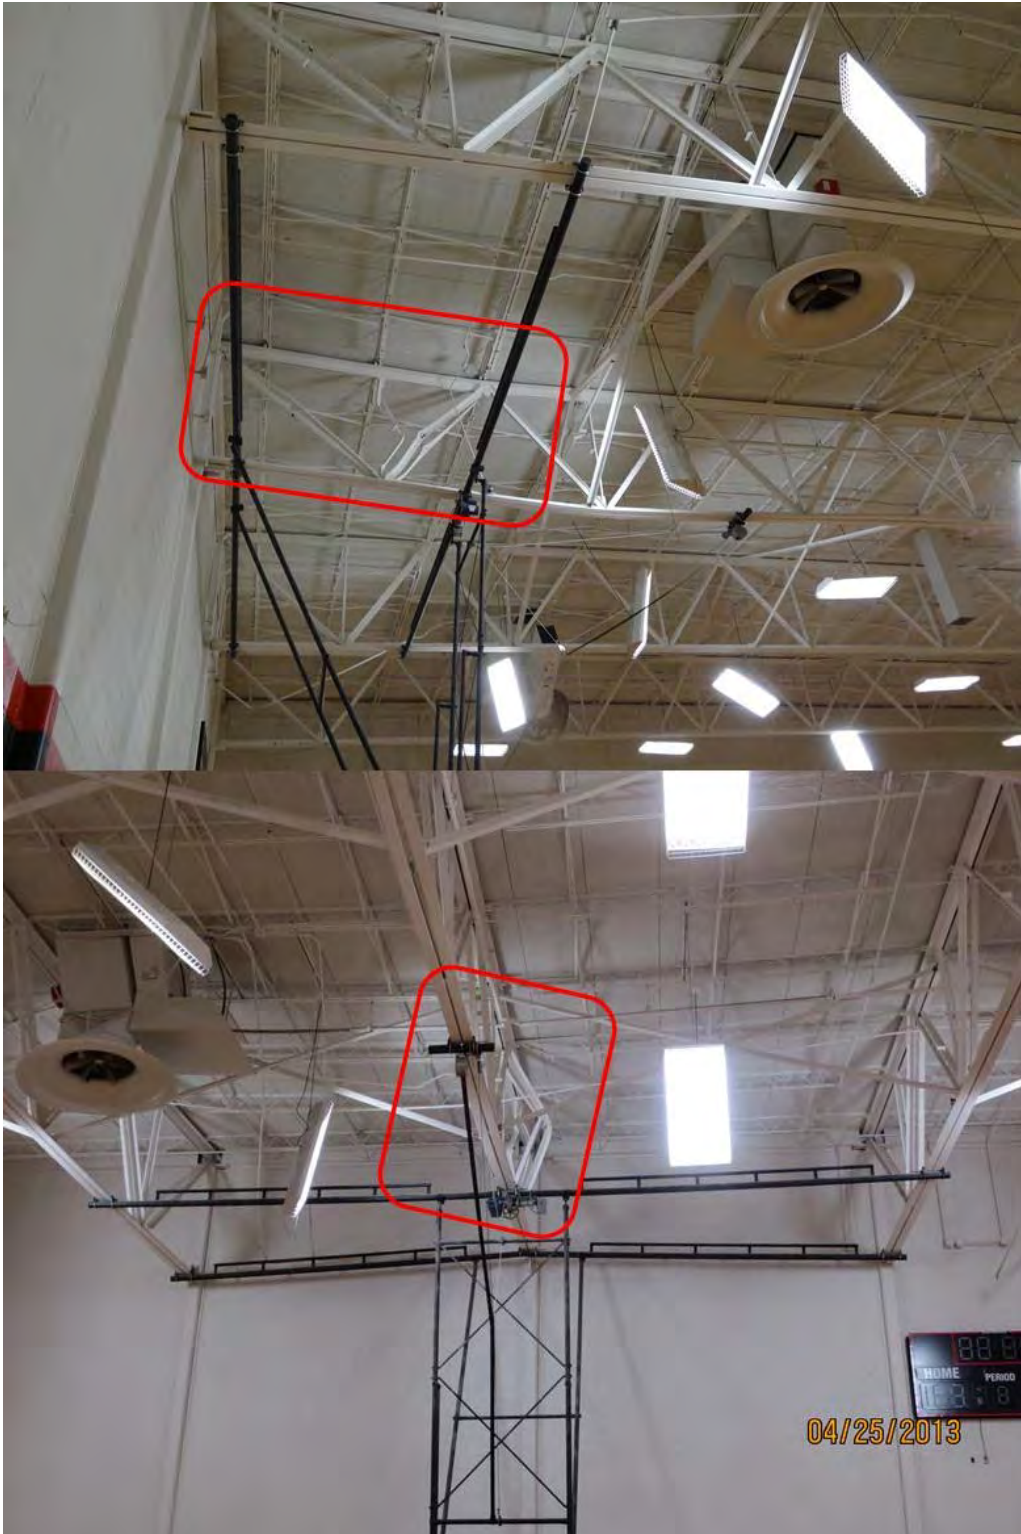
Joist Girder Damage in Gymnasium 2
